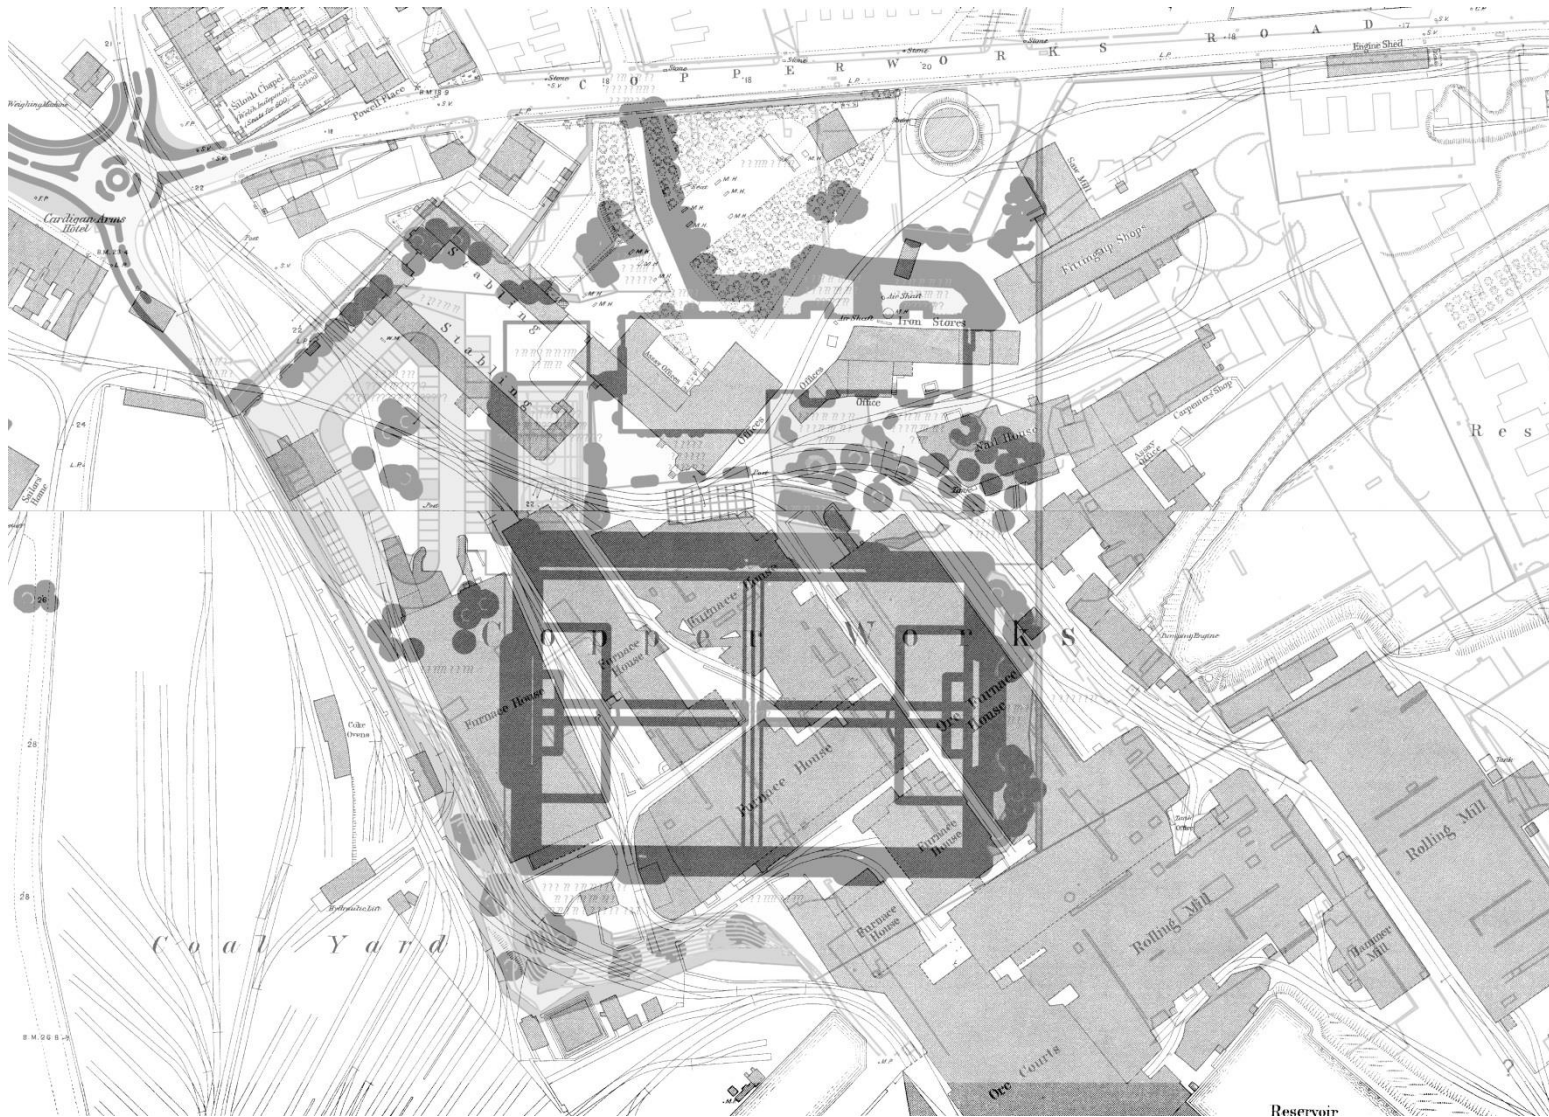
Extract of 1880 1:500 scale Ordnance Survey Town Plan of Llanelli, showing detail of the Copperworks site at its apogee in the late 19th century over which has been overlain the latest design (26/11/2014) of the new school development
